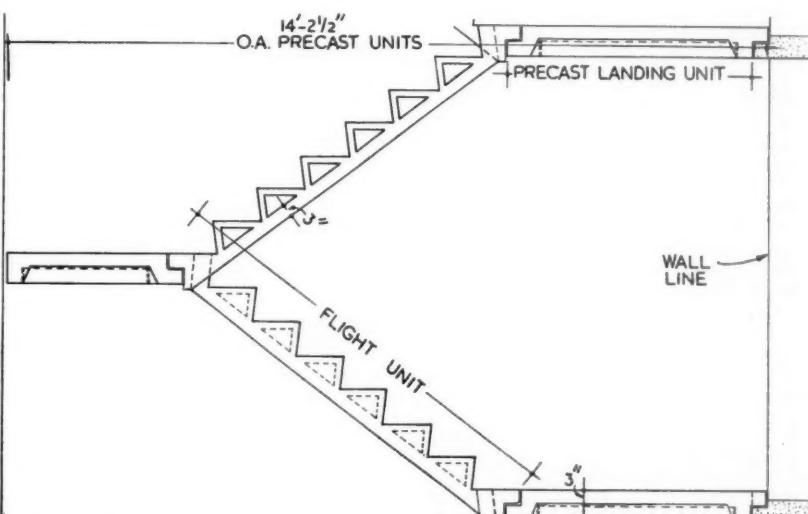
Section through precast construction of public stairs. Landings and flights are lowered into position by a tower crane. So far used only on point blocks
